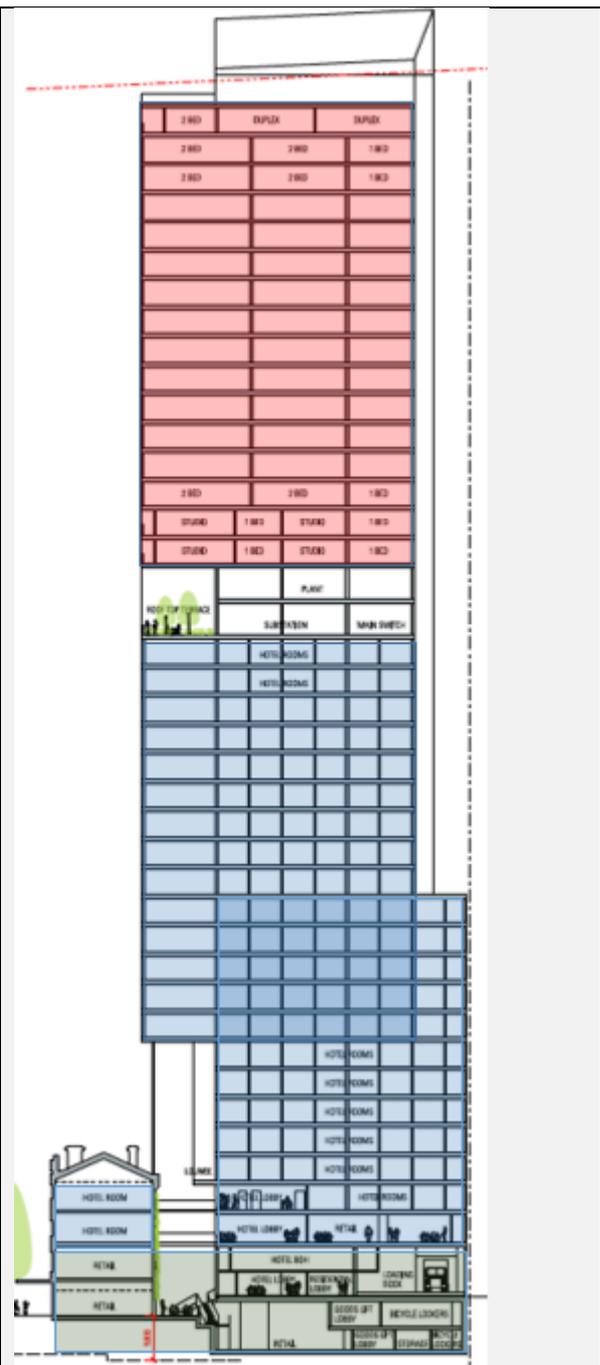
Indicative east-west section (residential in red, hotel in blue, retail in green)
